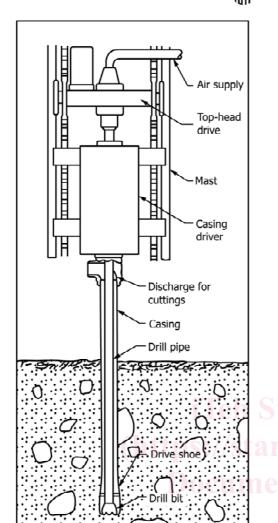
Casing Drivers can be Fitted to Top-Head Drive Rotary Rigs to Simultaneously Drill and Drive Casing
